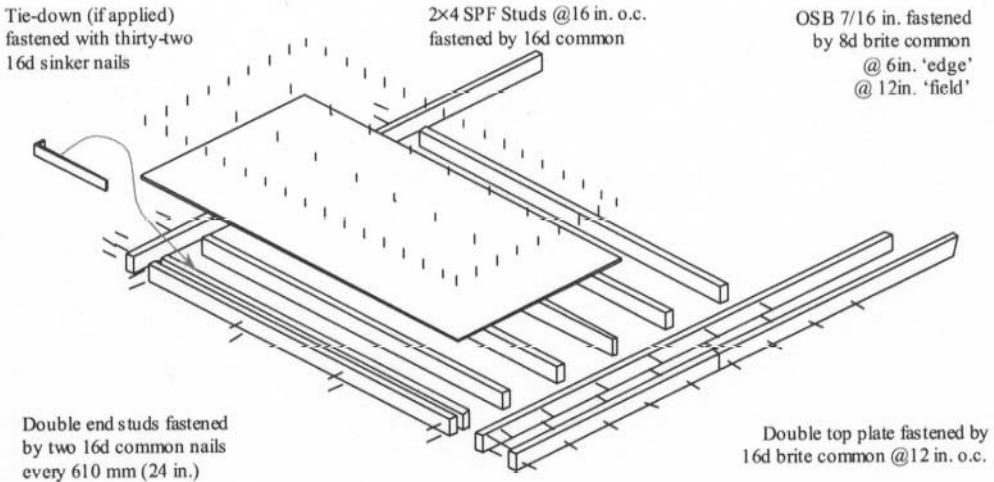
Typical construction of a shear wall (Courtesy of Heine 1997)
